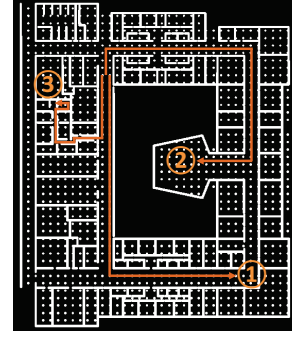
Preprocessed floorplan and Route #1, #2, and #3
